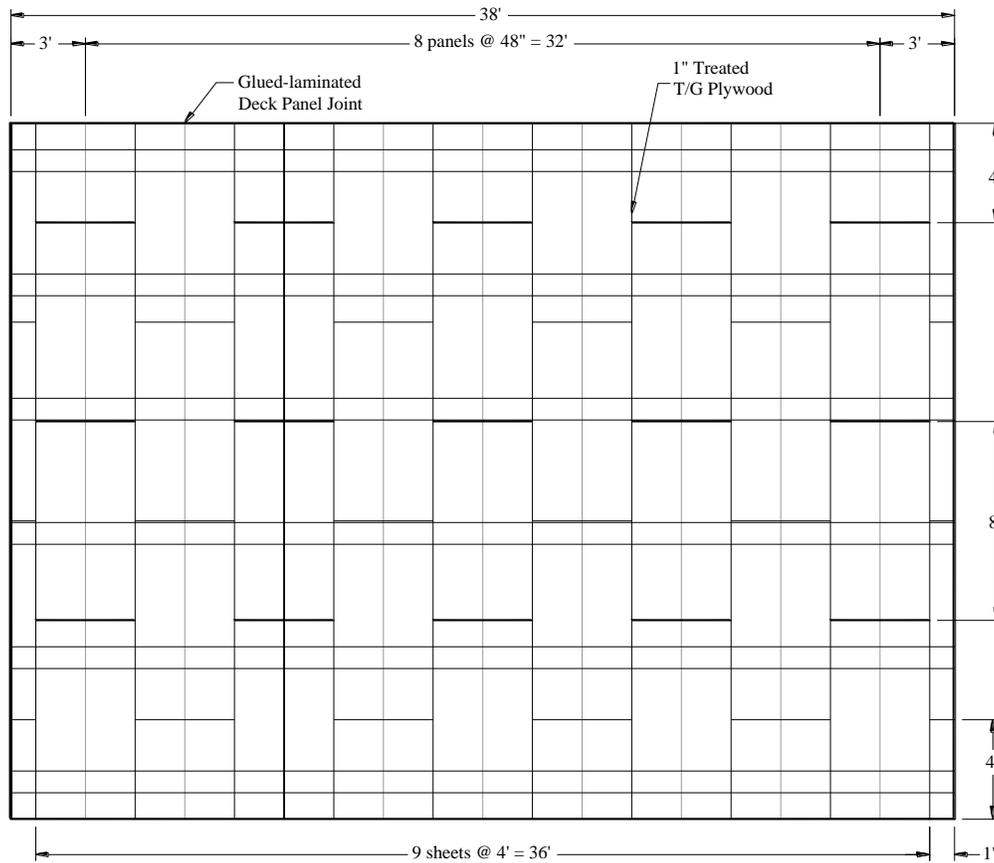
Plan layout of plywood on demonstration bridge, Span 1
